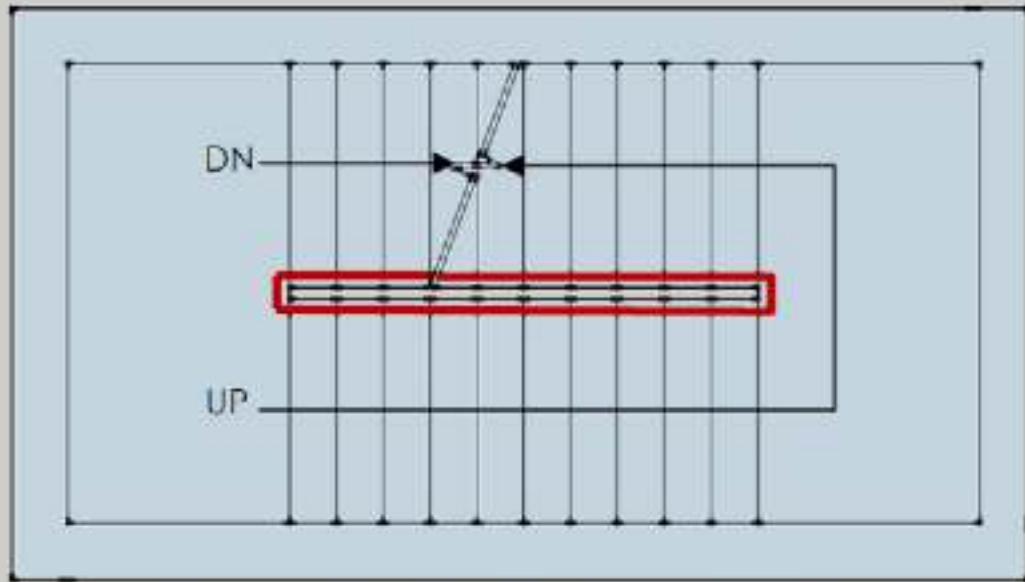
TYPICAL PLAN OF A DOG LEGGED STAIRCASE
